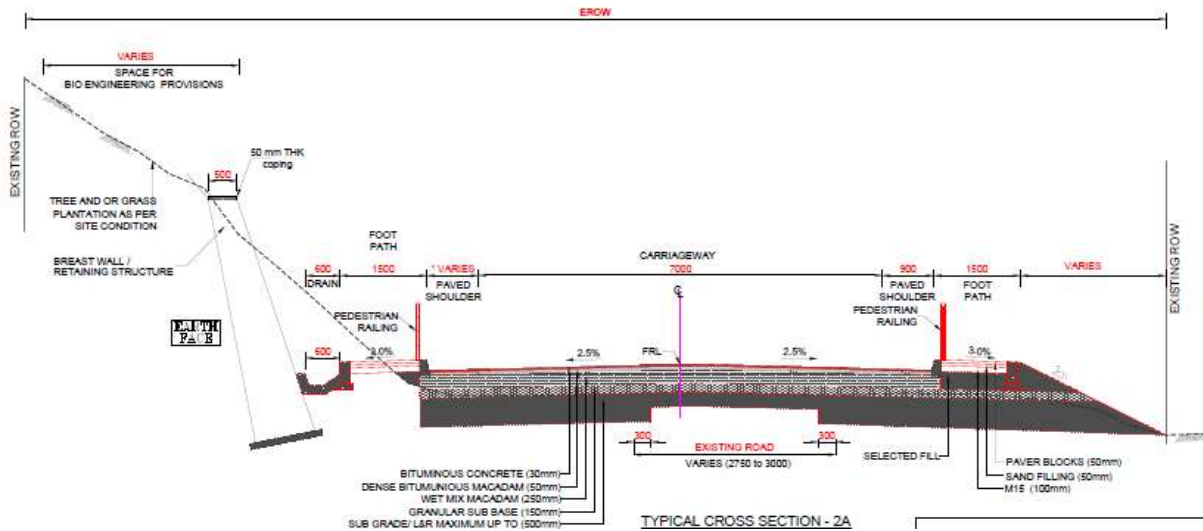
Typical Cross Section with Built-up Section (TCS-2A)
